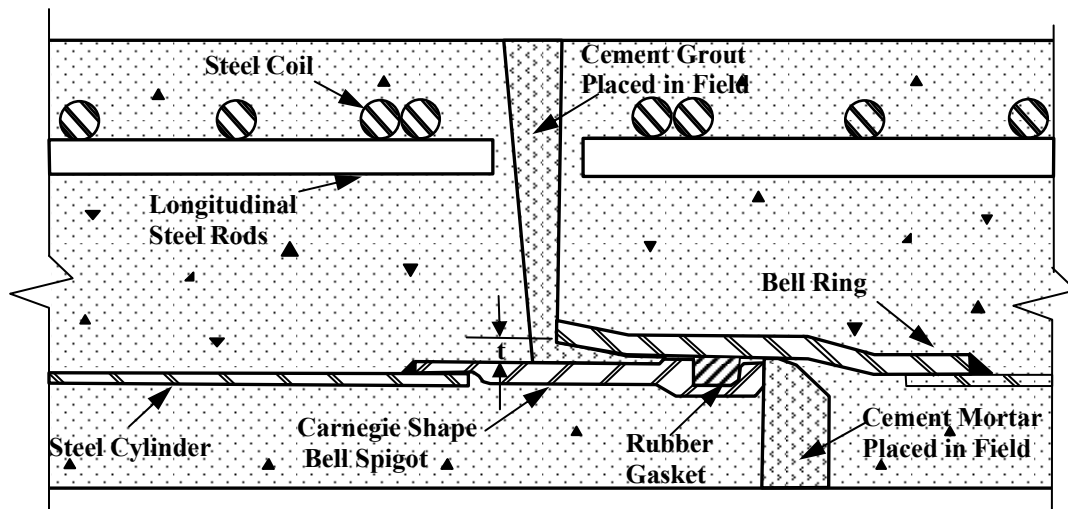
Schematic Drawing of JCCP Joint Cross-Section
